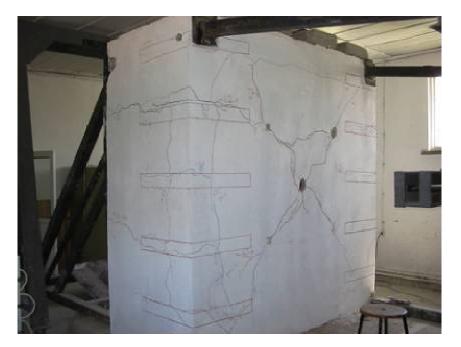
The cracking pattern of Wall C corresponding to ultimate stage.
